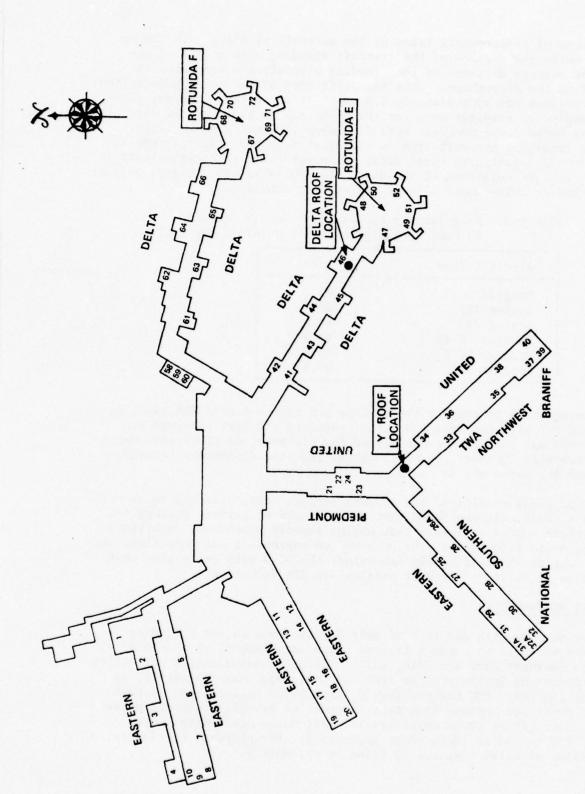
ATLANTA AIRPORT TERMINAL BUILDING LAYOUT
